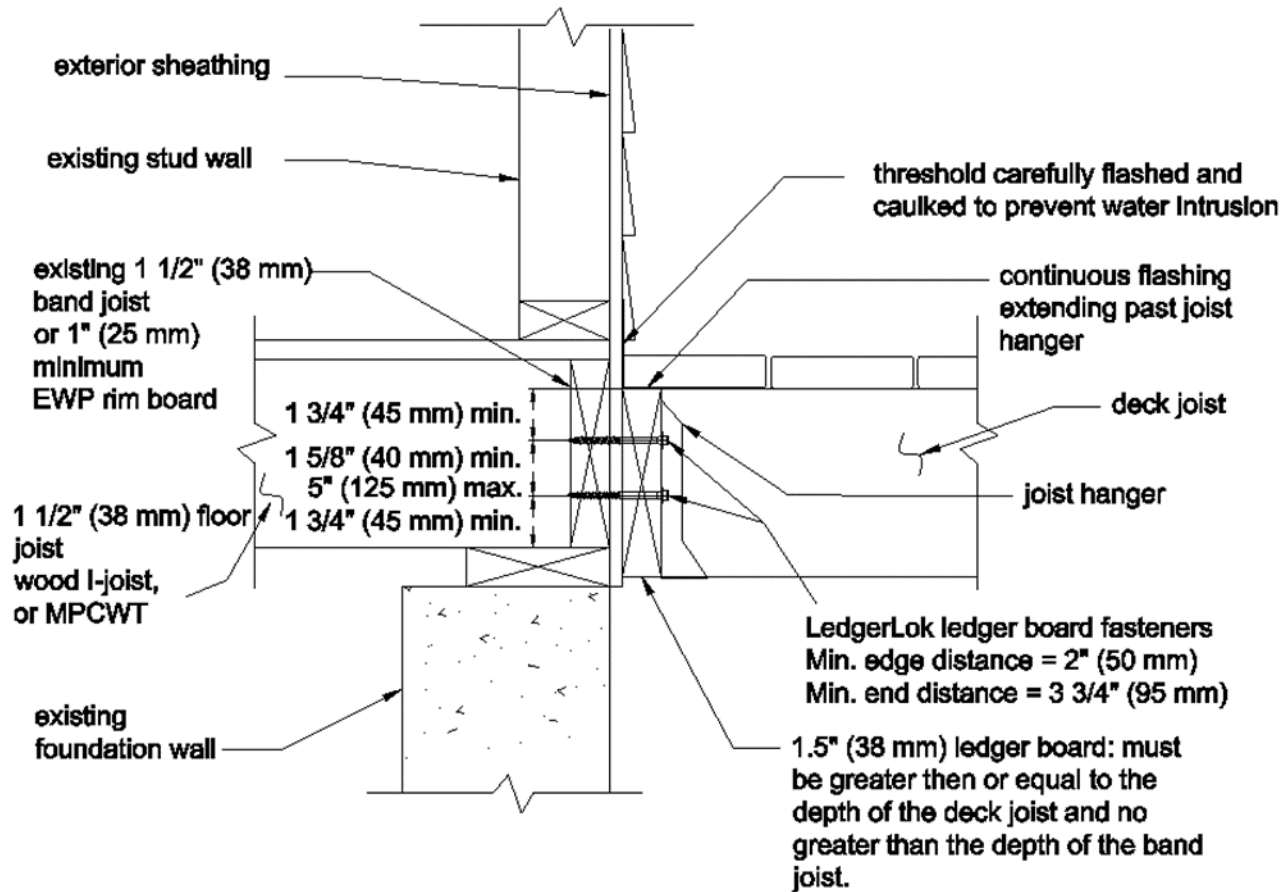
LEDGERLOK™ LEDGER BOARD FASTENER DECK CONNECTION
